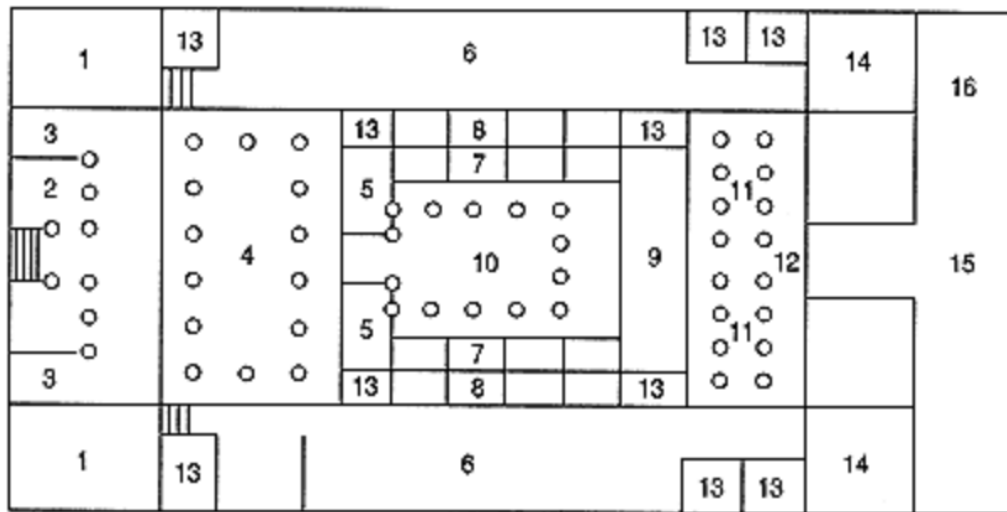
Plan of the ground floor of an elaborate Nakarattar house with the number denoting the following. Front (Male) Section of House: 1. *Munn arai*: front room, 2. *Murram*: courtyard, 3. *Talvaram*: corridor. Central Section of House: 4. *Kalyana Kottakai*: marriage hall, 5. *Patakasalai, tinnai*: the 'public' room in a house, 6. *Bhojana salai*: dining hall, 7. *Veliarai*: outer room, 8. *Ullarai*: inner room, 9. *Irantam maiya arai*: second central hall, 10. *Murram*: courtyard, roofed or covered with grillwork. Back (Female) Section of House: 11. *Murram*: courtyard, roofed or covered with grillwork, 12. *Talvaram*: corridor, 13. *Kalanjiyam*: storeroom, 14. *Samayal arai*: kitchen, 15. *Pin kattu*: backyard 16. *Keni*: well (Rudner 1994, Plate 10).
